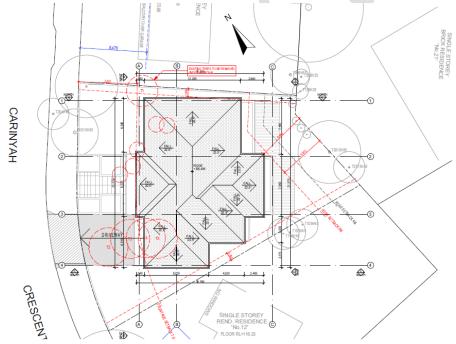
Site Plan of 9 Viola Place, Greystanes (Peak Architects)
